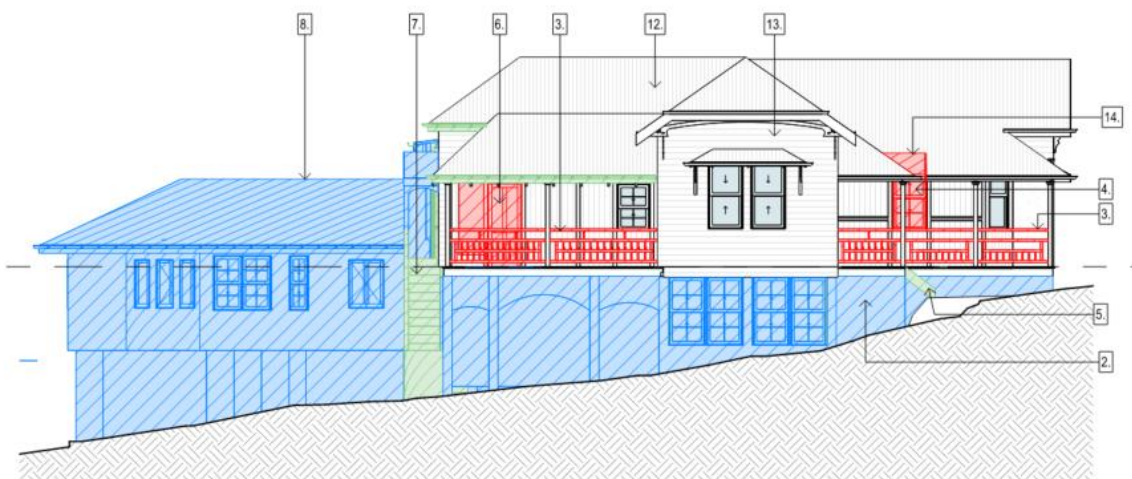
Proposed Demolition - Northern Elevation (Tooth Avenue)
